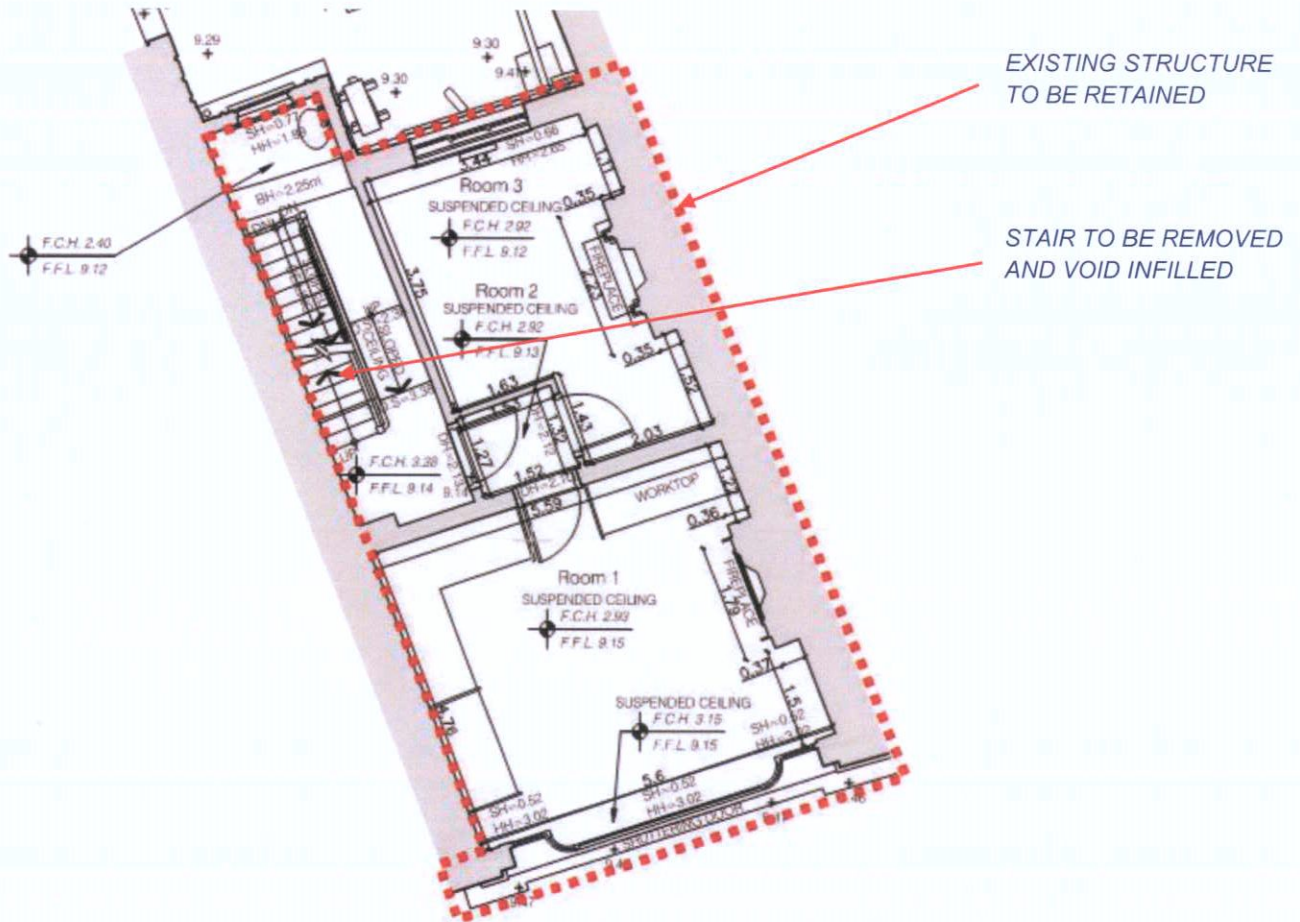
No. 36 Henry Street - Stair to be Removed – Murphy's Survey Drawing DC-MUR-3X-01-FP-G-00-1216.
